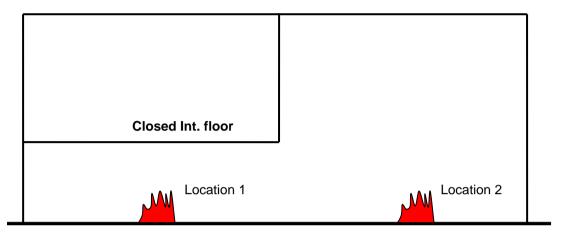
Schematic diagram of a firecell containing a closed intermediate floor and fire locations (section view)
